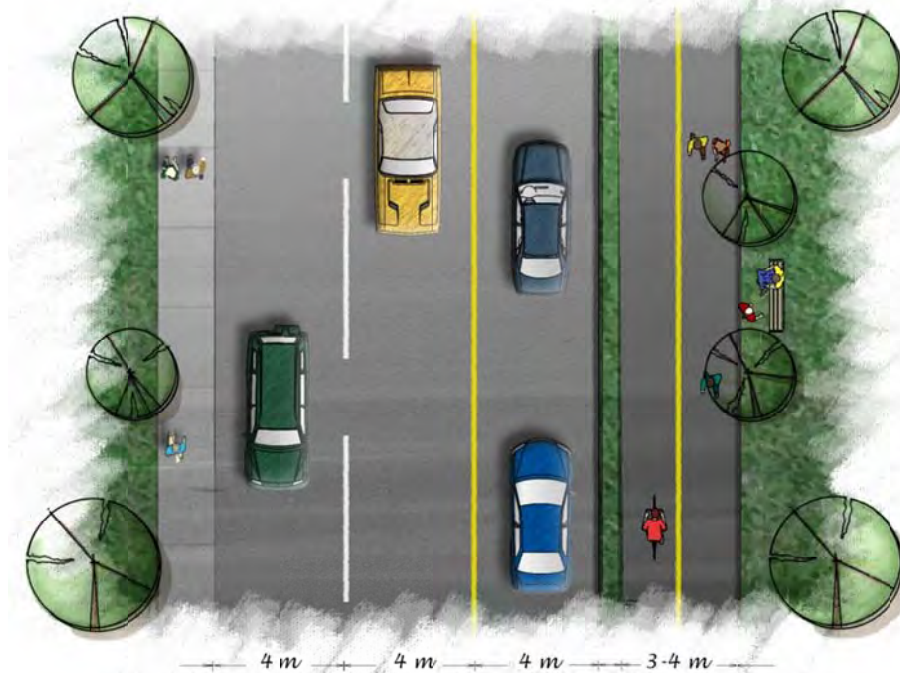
Conceptual Lane Layout - Road Diet (Multi-Use Pathway)
